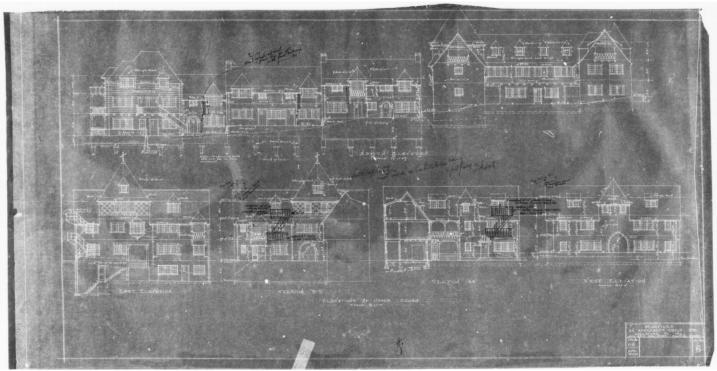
Beauville, Elevations of Upper Court – 1928 (6 of 7)
